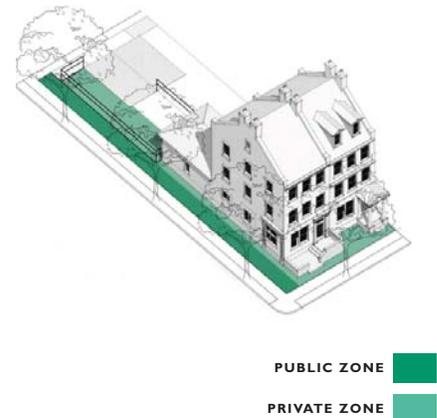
Typical location of Front Yards and Side-Street Yards
